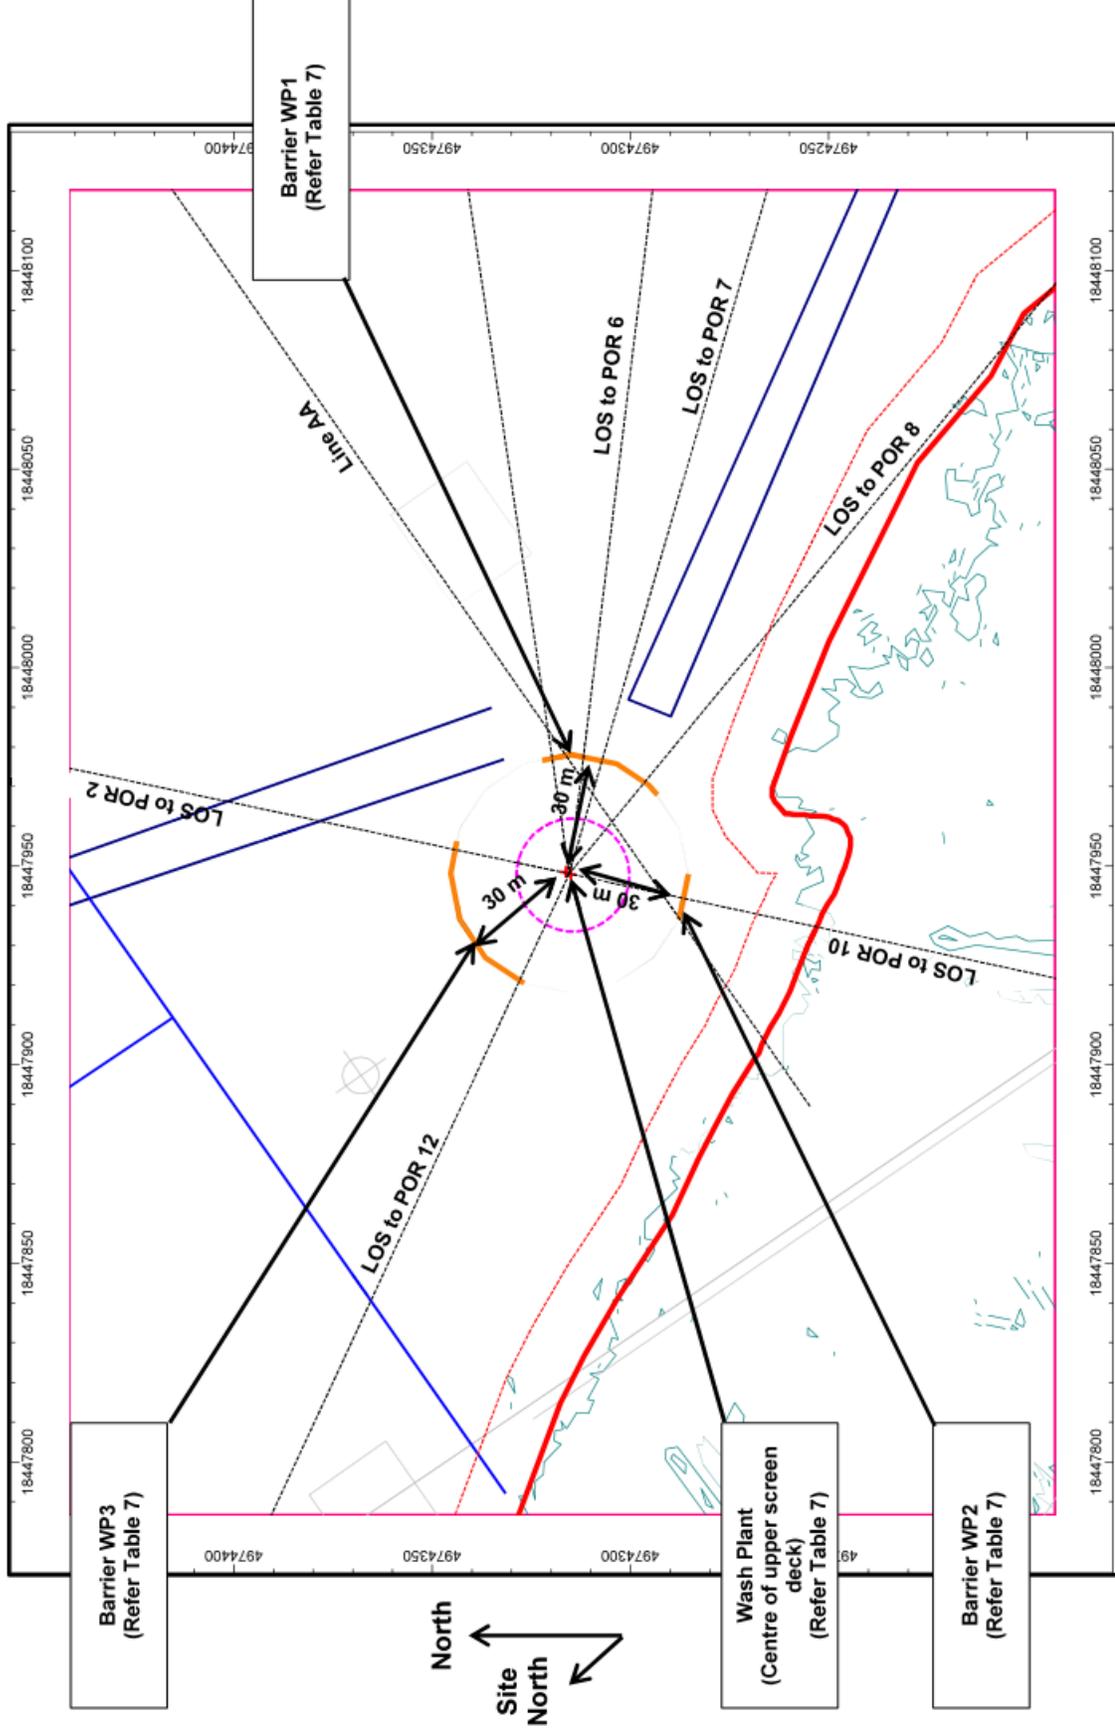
Detailed Plan at Wash Plant showing Recommended Noise Barriers (Stockpiles)
